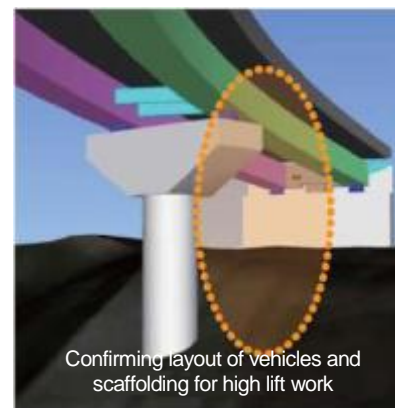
Setting the Level of Detail for a 3D Model around Girder Ends
